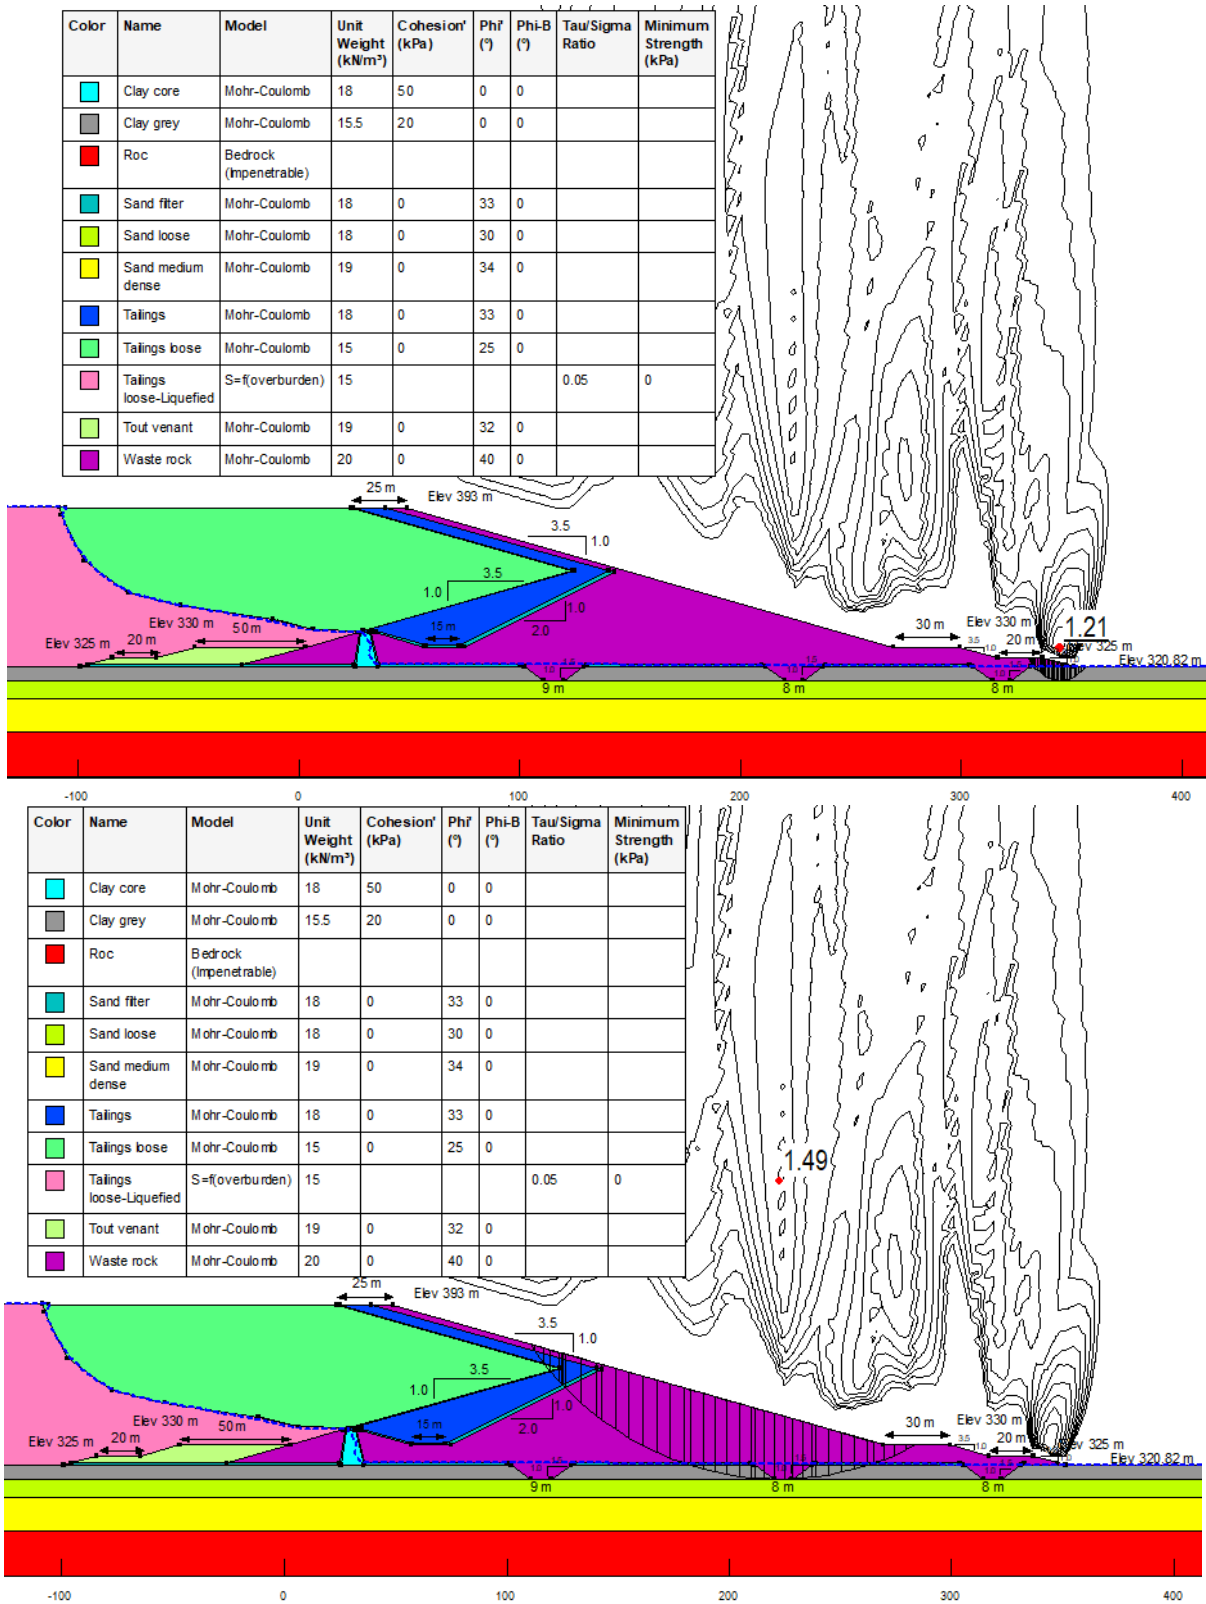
Year 19 – downstream slope – pseudo-static loading.
